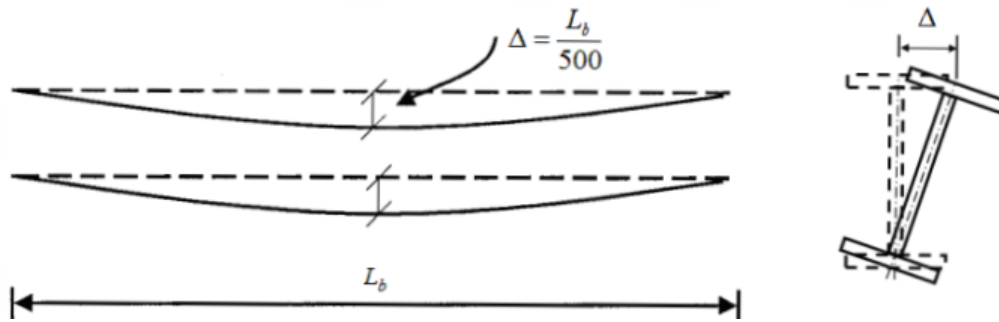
Shape and plan view of girder imperfections used in the study.
